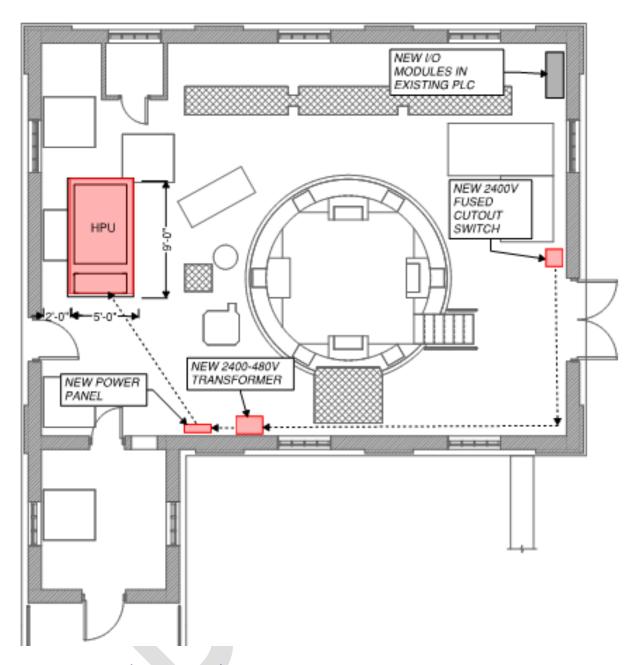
H-4 (Lake Gonzales) Building Plan
